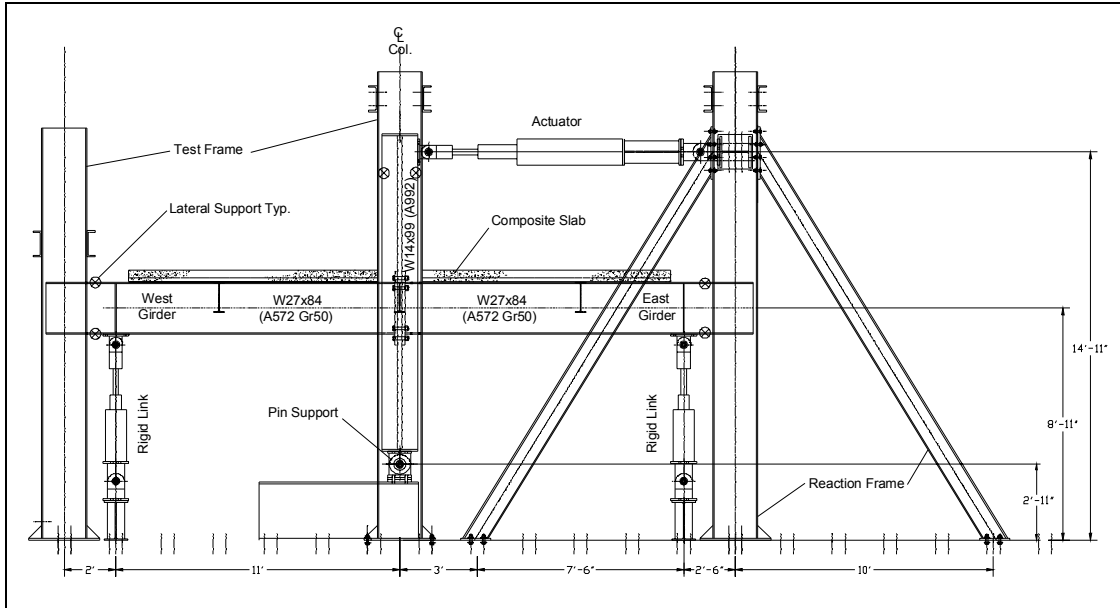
TEST SPECIMEN DETAIL, W27x84-SLAB
